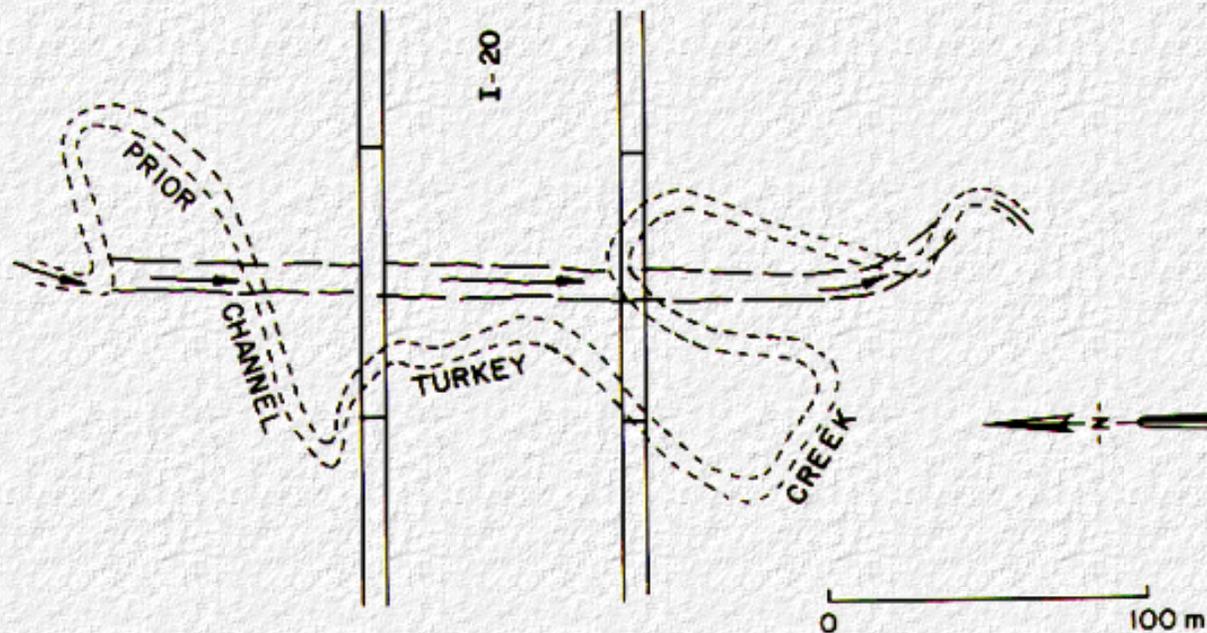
Plan Sketch of Turkey Creek Channel Relocation (Case 14)
